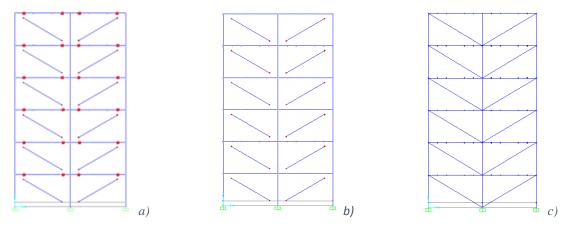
Analyzed frames with six storeys: a) Frame A, b) Frame B, c) Frame C
